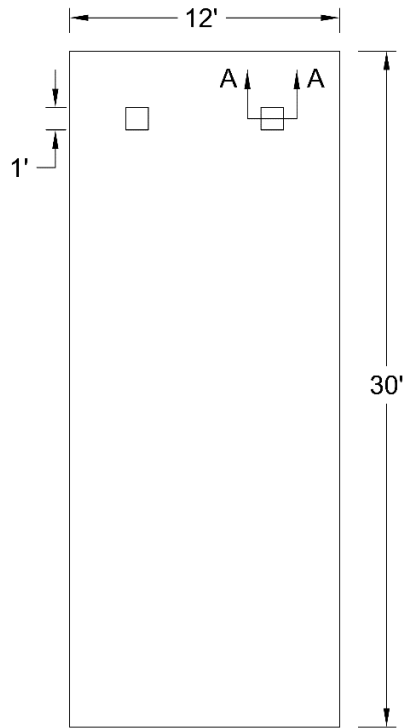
Panel layout of SWP example analyzed with solid sections at roof connections
